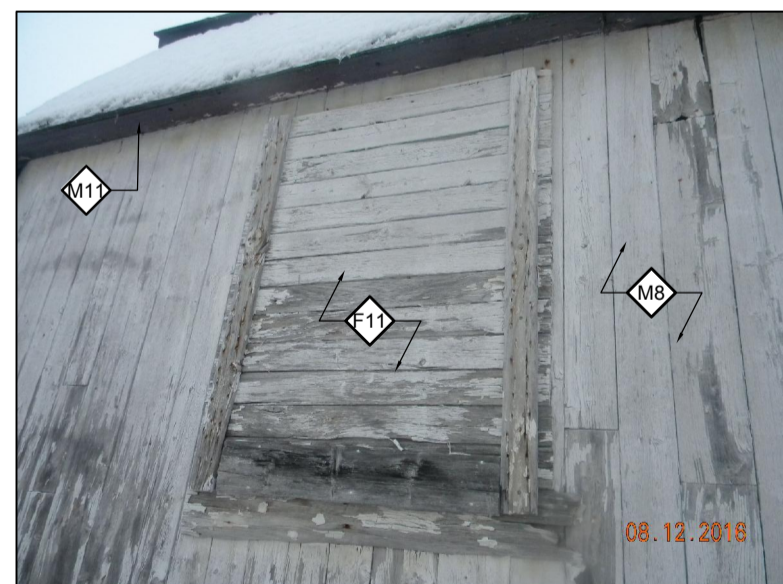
HORIZONTAL SIDING BOARD TO BE DEMOLISHED
